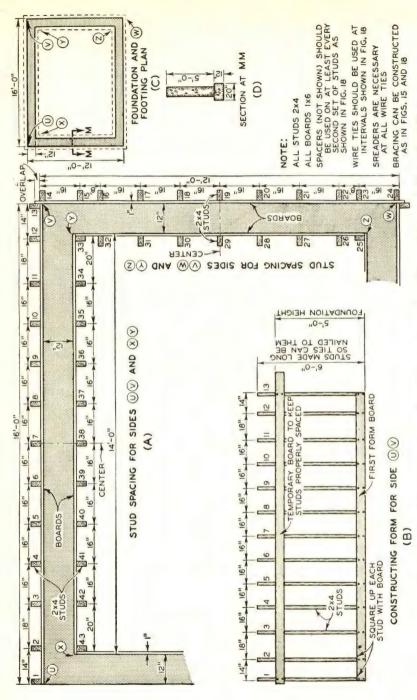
Corner Construction and Other Details for Tailor-Made Formwork Shown in Figs. 15 and 18
